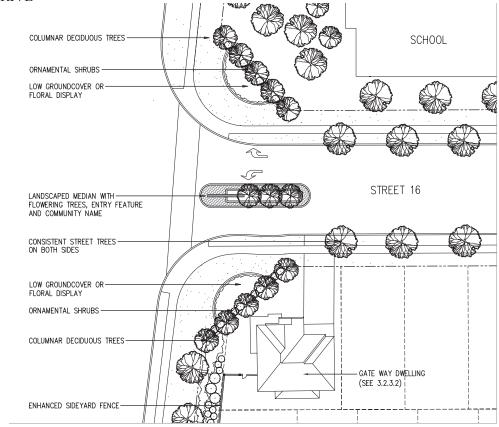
Neighbourhood Gateway Concept Plan
